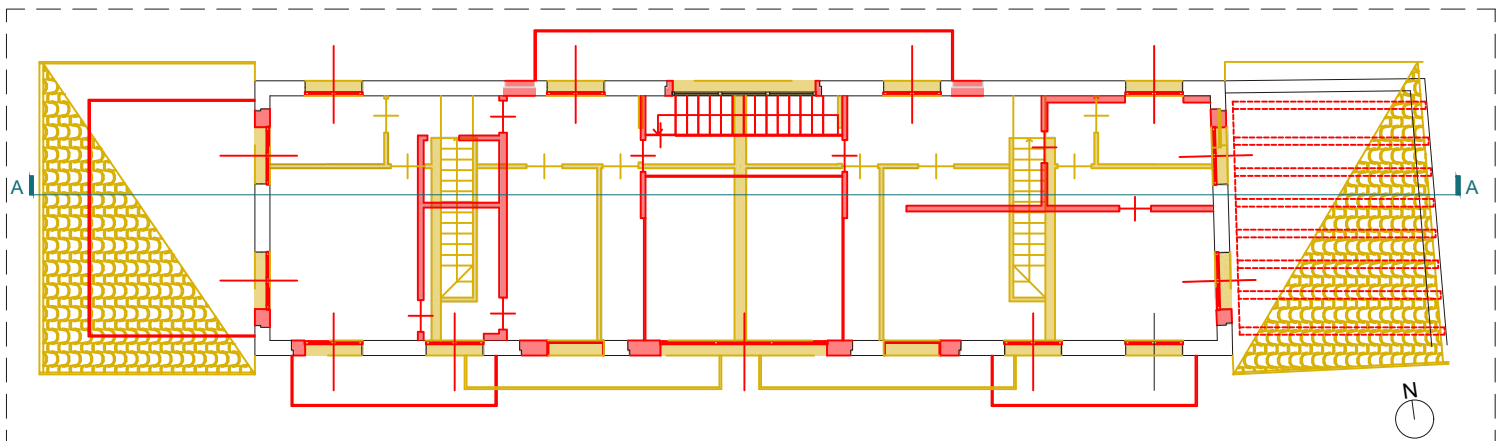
Demolition/reconstruction FIRST FLOOR PLAN
